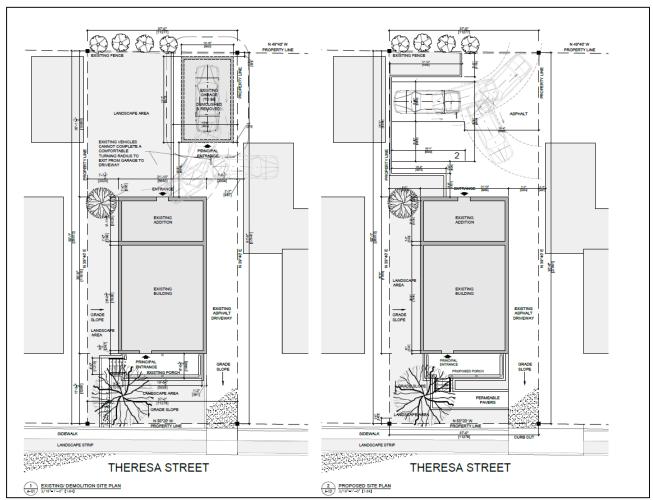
Existing Site Plan (Left) and Proposed Site Plan with Additional Parking (Right)
